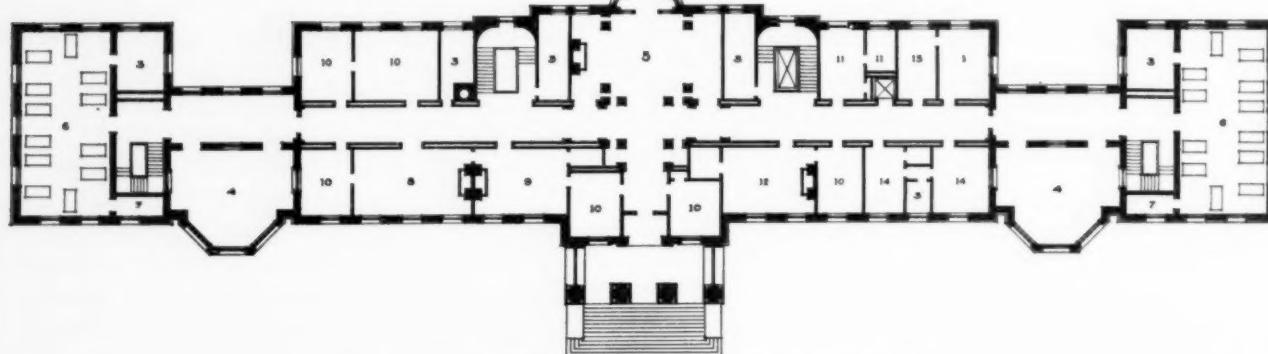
Walter Reed Hospital—First floor plan of main building.
